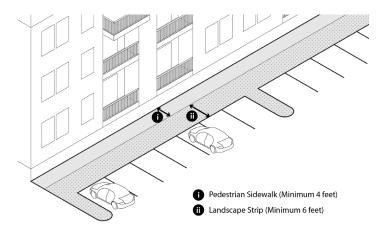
Parking spaces shall be separated from buildings by a pedestrian sidewalk and a landscape strip.
